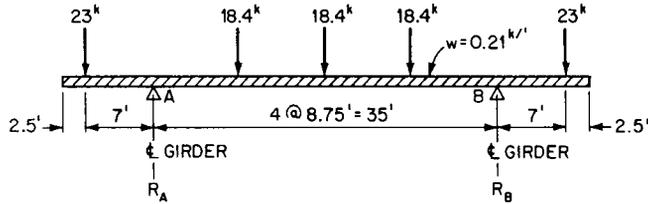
Dead loads on a floorbeam of the deck-girder bridge.
